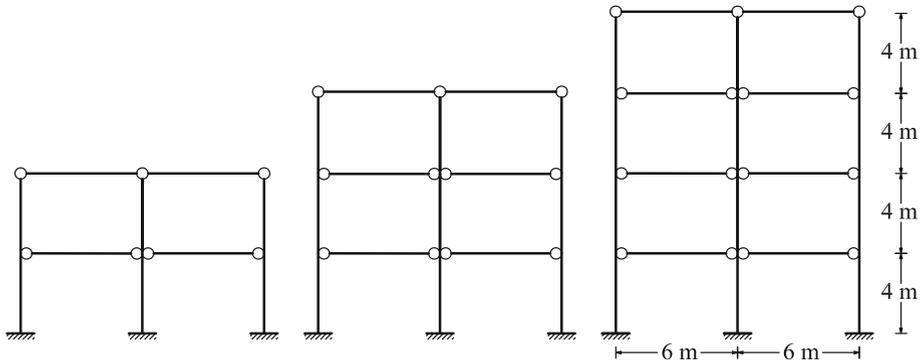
Multistory precast concrete frames with pinned beam-to-column joints
